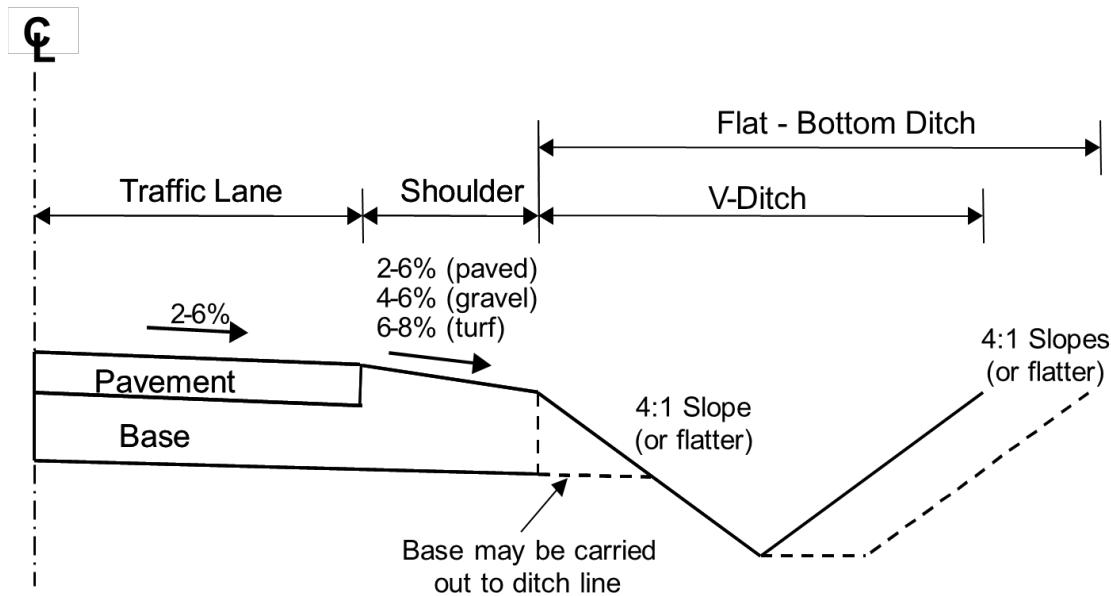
Recommended Pavement Cross Slopes and Drainage Ditch (Zimmerman et al. 2007)
